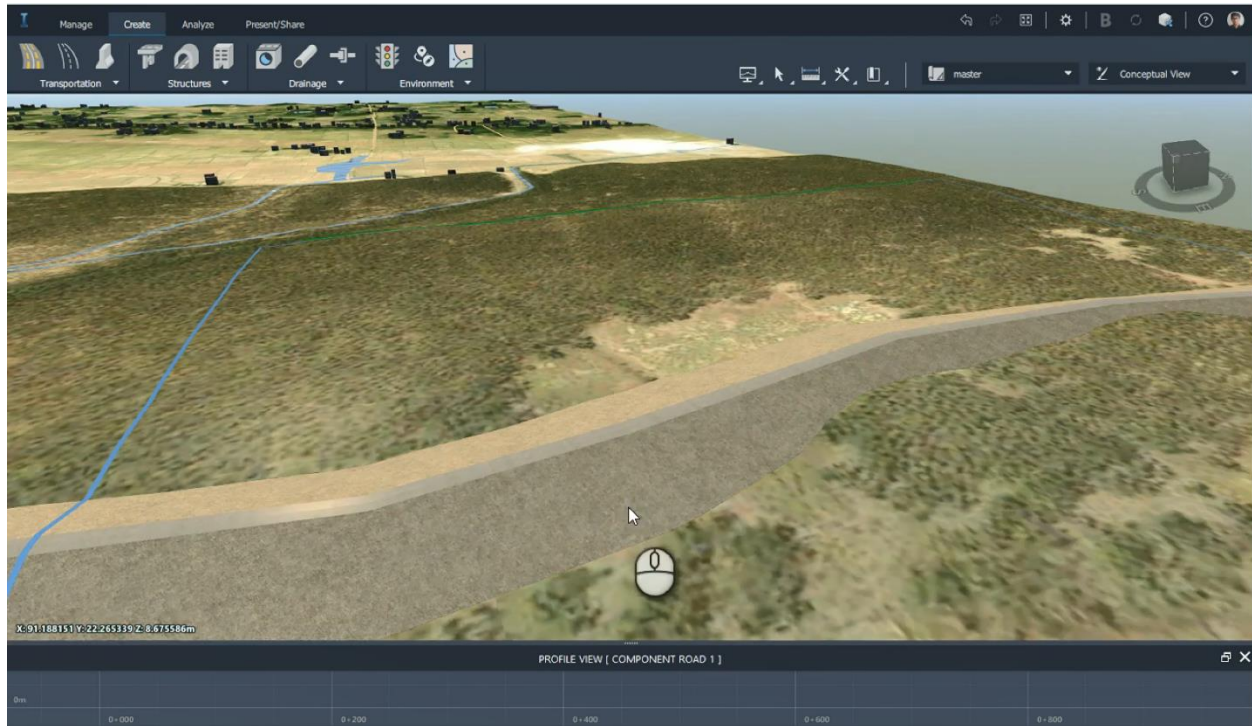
MODELLING EMBANKMENT IN INFRAWORKS
